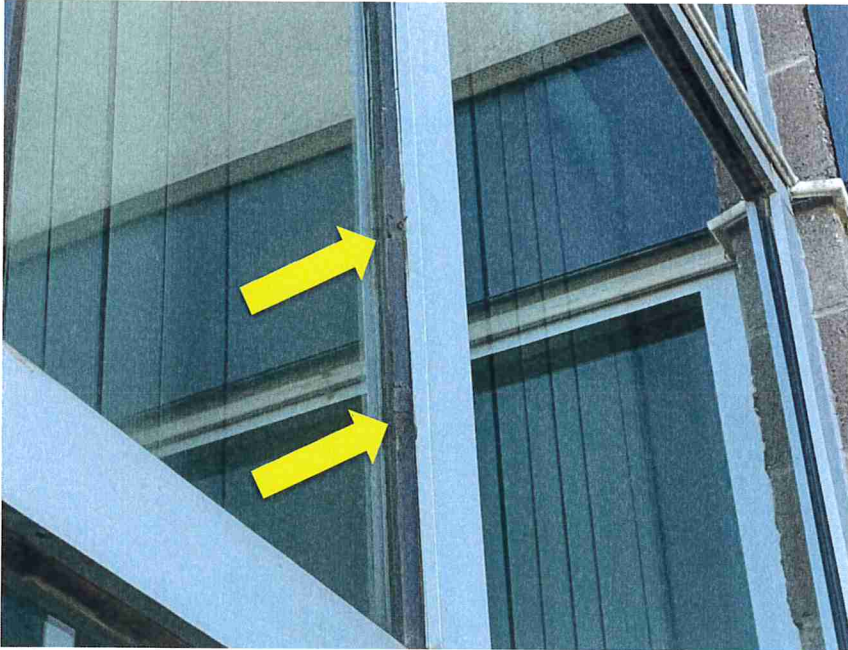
Seals at the curtainwall on the north side had cracks and holes.
